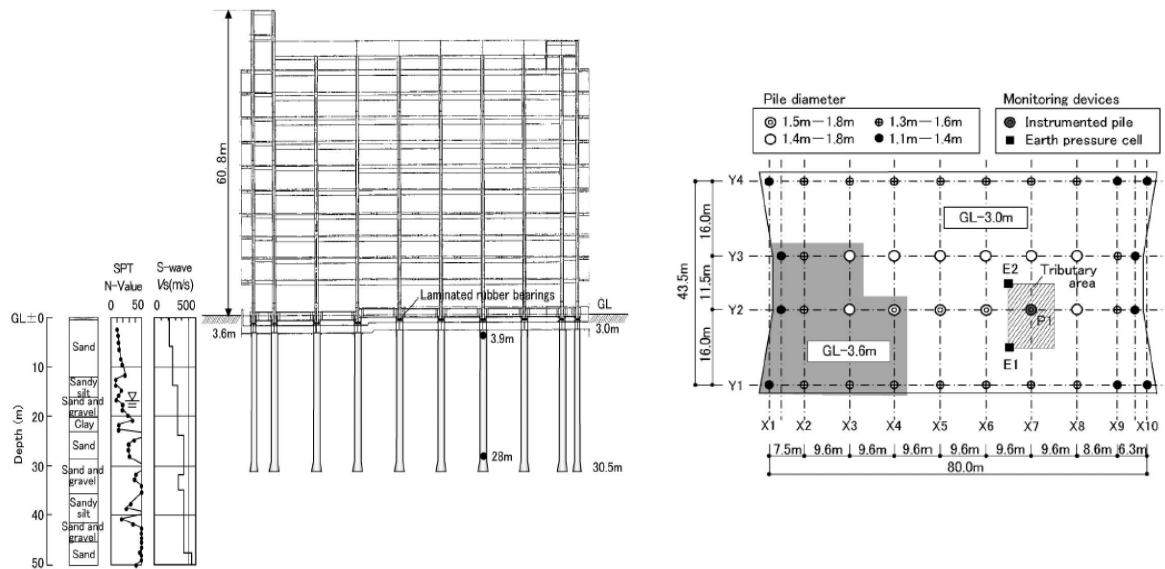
Soil profile, foundation plan and elevation of eleven story base-isolated office building, adapted from Yamashita et al. (2011)
